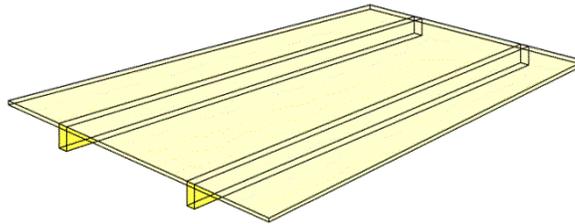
Beam and One-Way Slab Floor System
